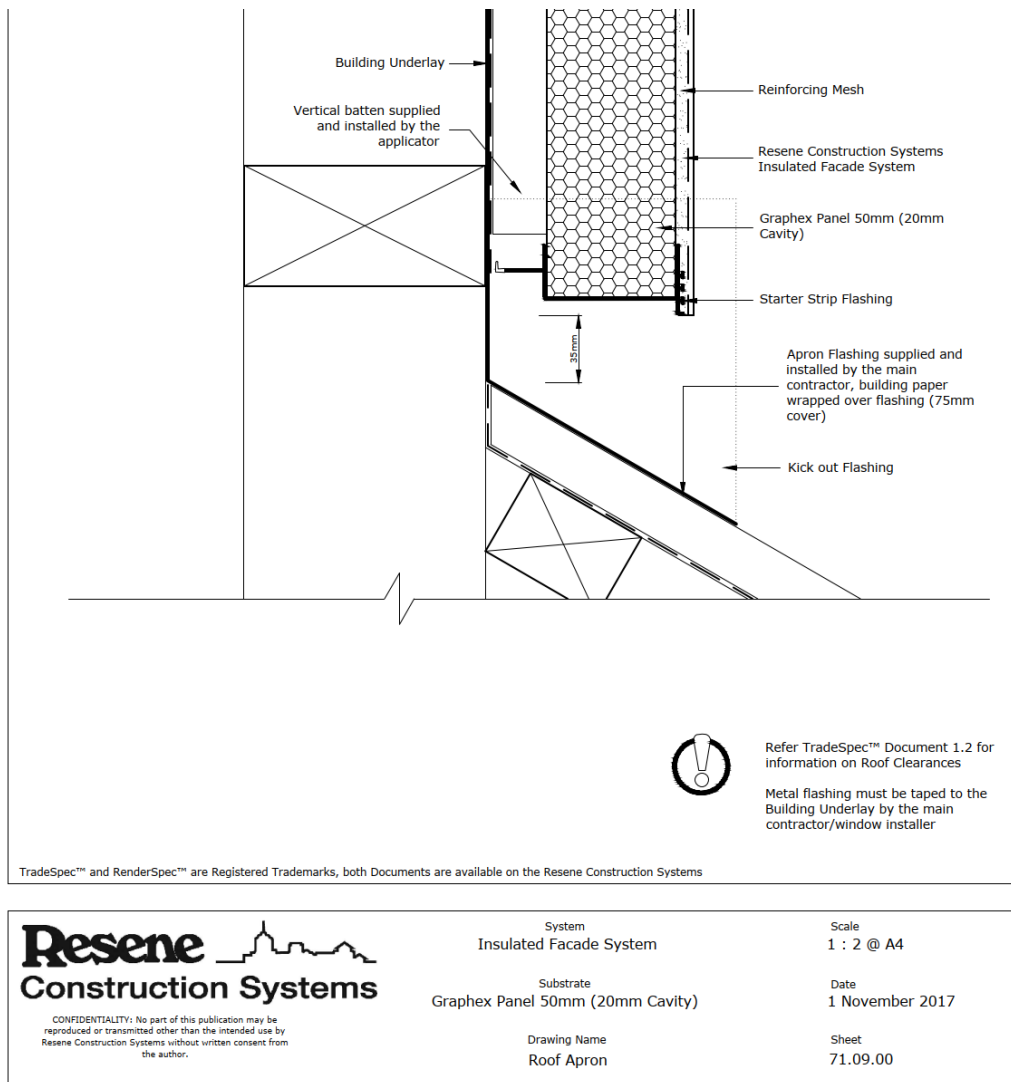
How big is the ventilation gap for the starter strip? 1000mm<sup>2</sup> per meter of wall or more? This needs to be determined.
